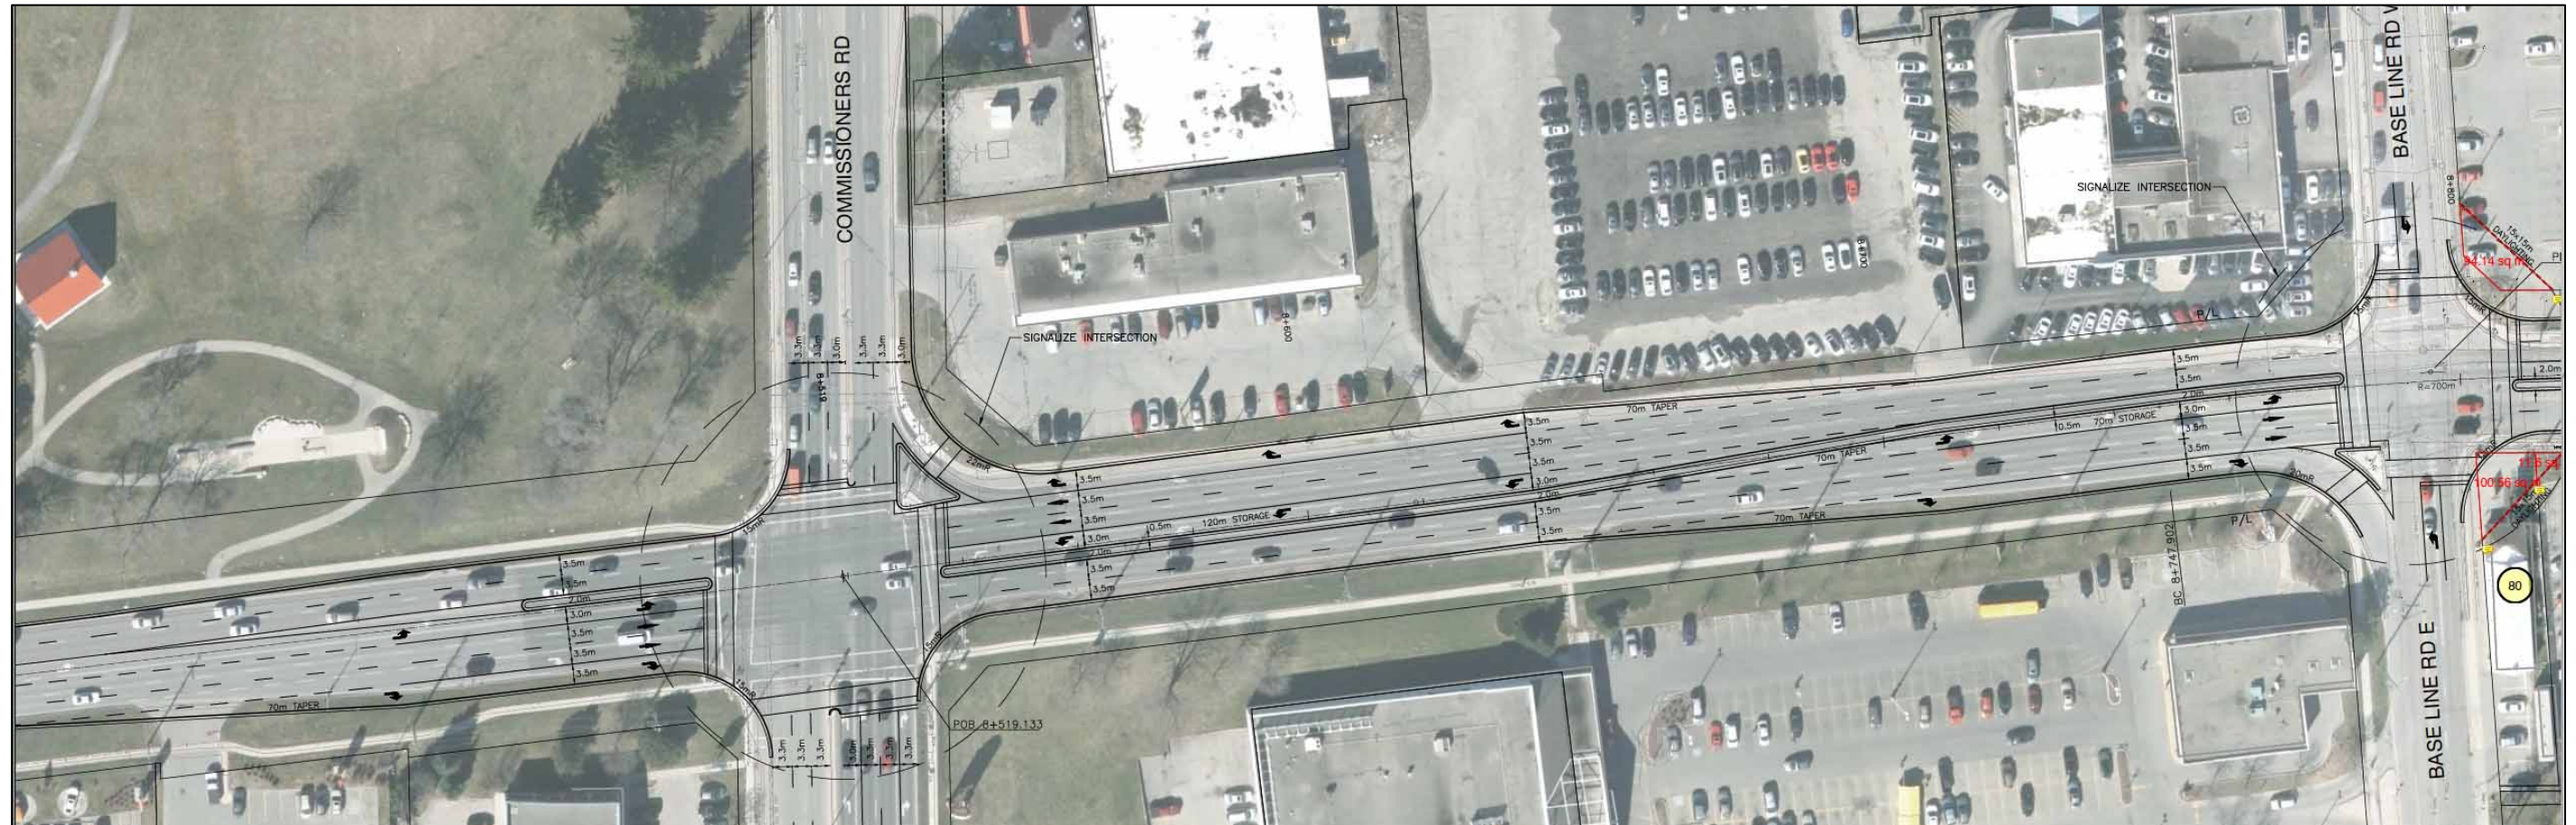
Section of the Wharnccliffe Road South study corridor from Base Line Road (right) to Commissioners Road East/West (left) [Wharnccliffe Road New Construction Alternative (Commissioner to Briscoe), MMM Group, Preliminary Plan, October 2015].
